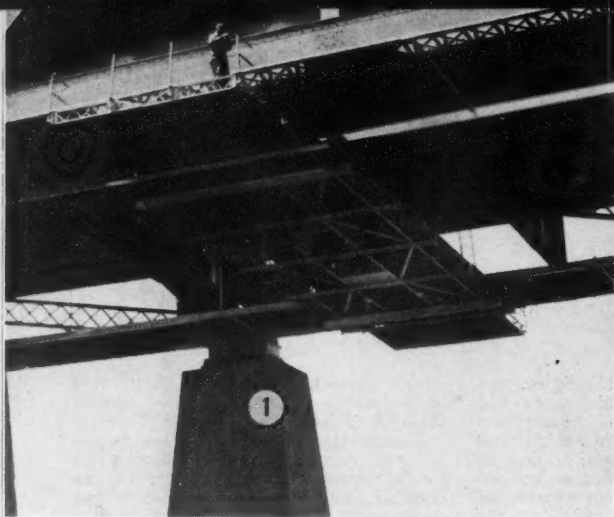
Lower deck travelling scaffold, air powered, gives full access to the bottom deck across full length of the bridge. Figure 2—Truss webb scaffold on the East Bay spans of the San Francisco-Oakland Bridge gives access to deck truss and suspension stiffening truss portions.
